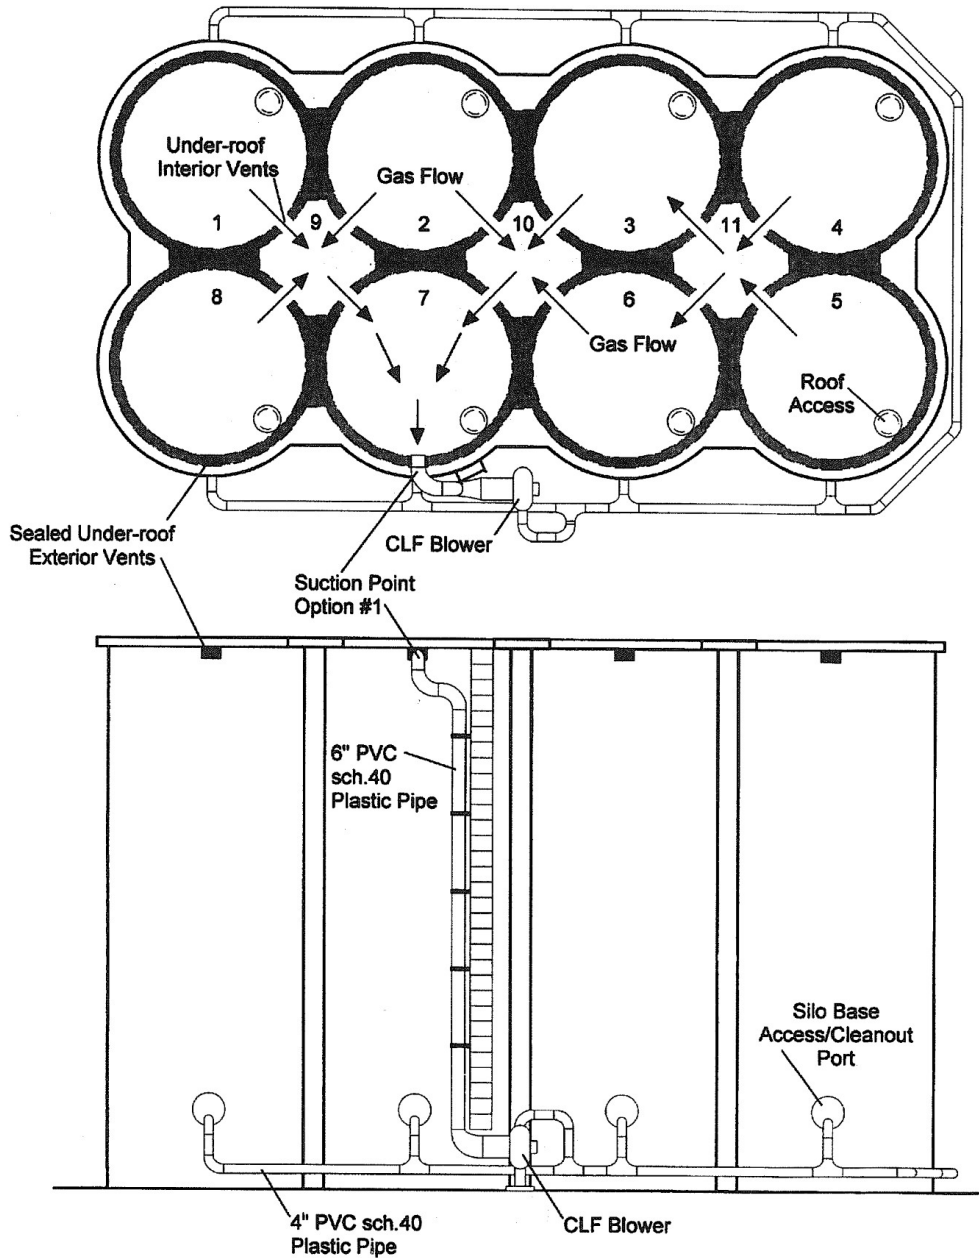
Manifold phosphine fumigation system pulls gas from the exterior under-roof vent of one concrete silo and recirculates the gas through the base inspection door of each silo.
